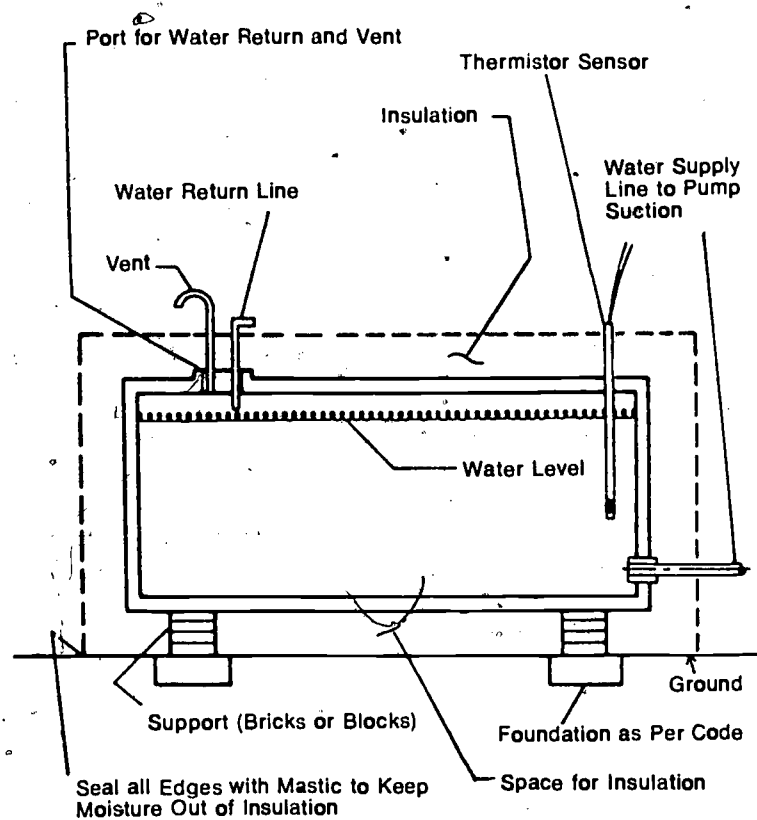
Typical Above-Ground Liquid Storage Tank Installation
